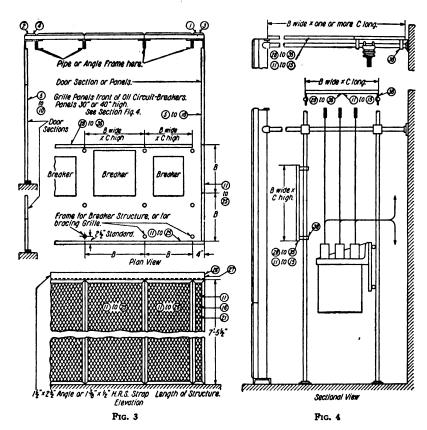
shows elevation of rear grillework enclosing a switchboard when the switchboard framework is self-supporting and independent of the wall support.
